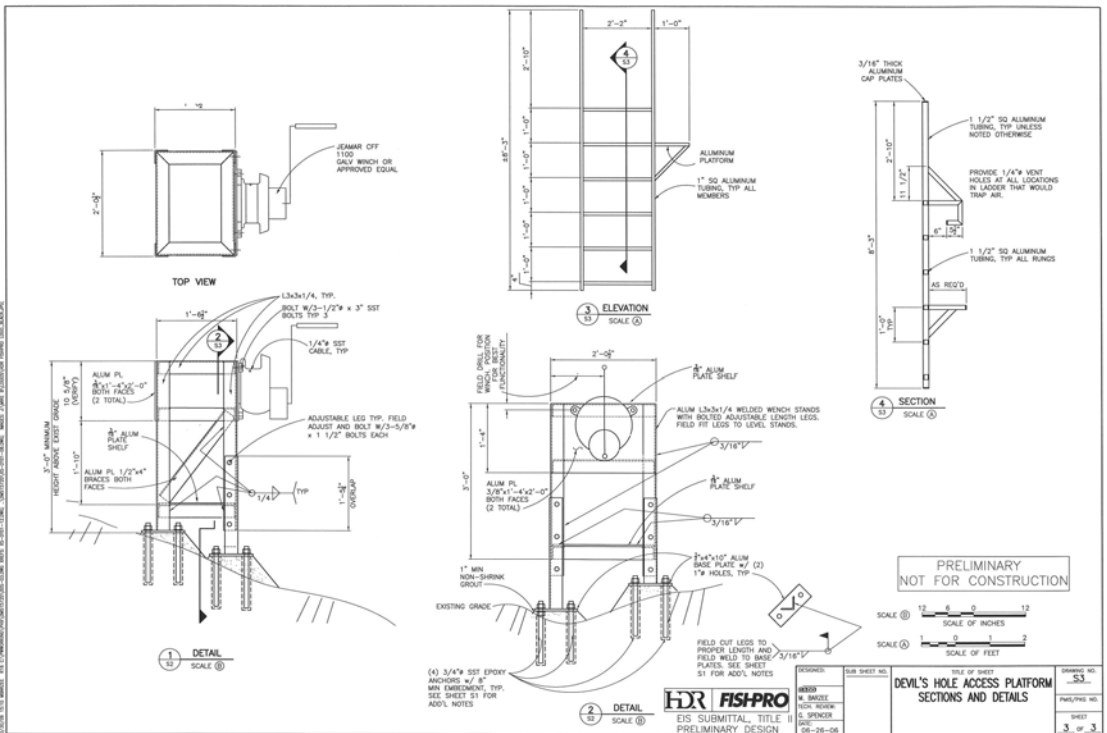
Hinged monitoring platform, bolted to east wall—Sectional views—Alternative B
